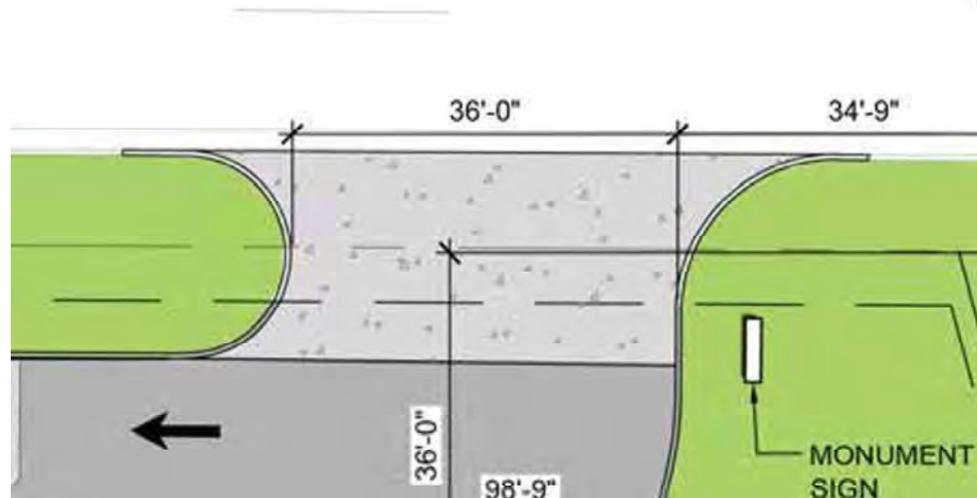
Excerpt of the 36-foot Driveway Width Request from the Site Plan
